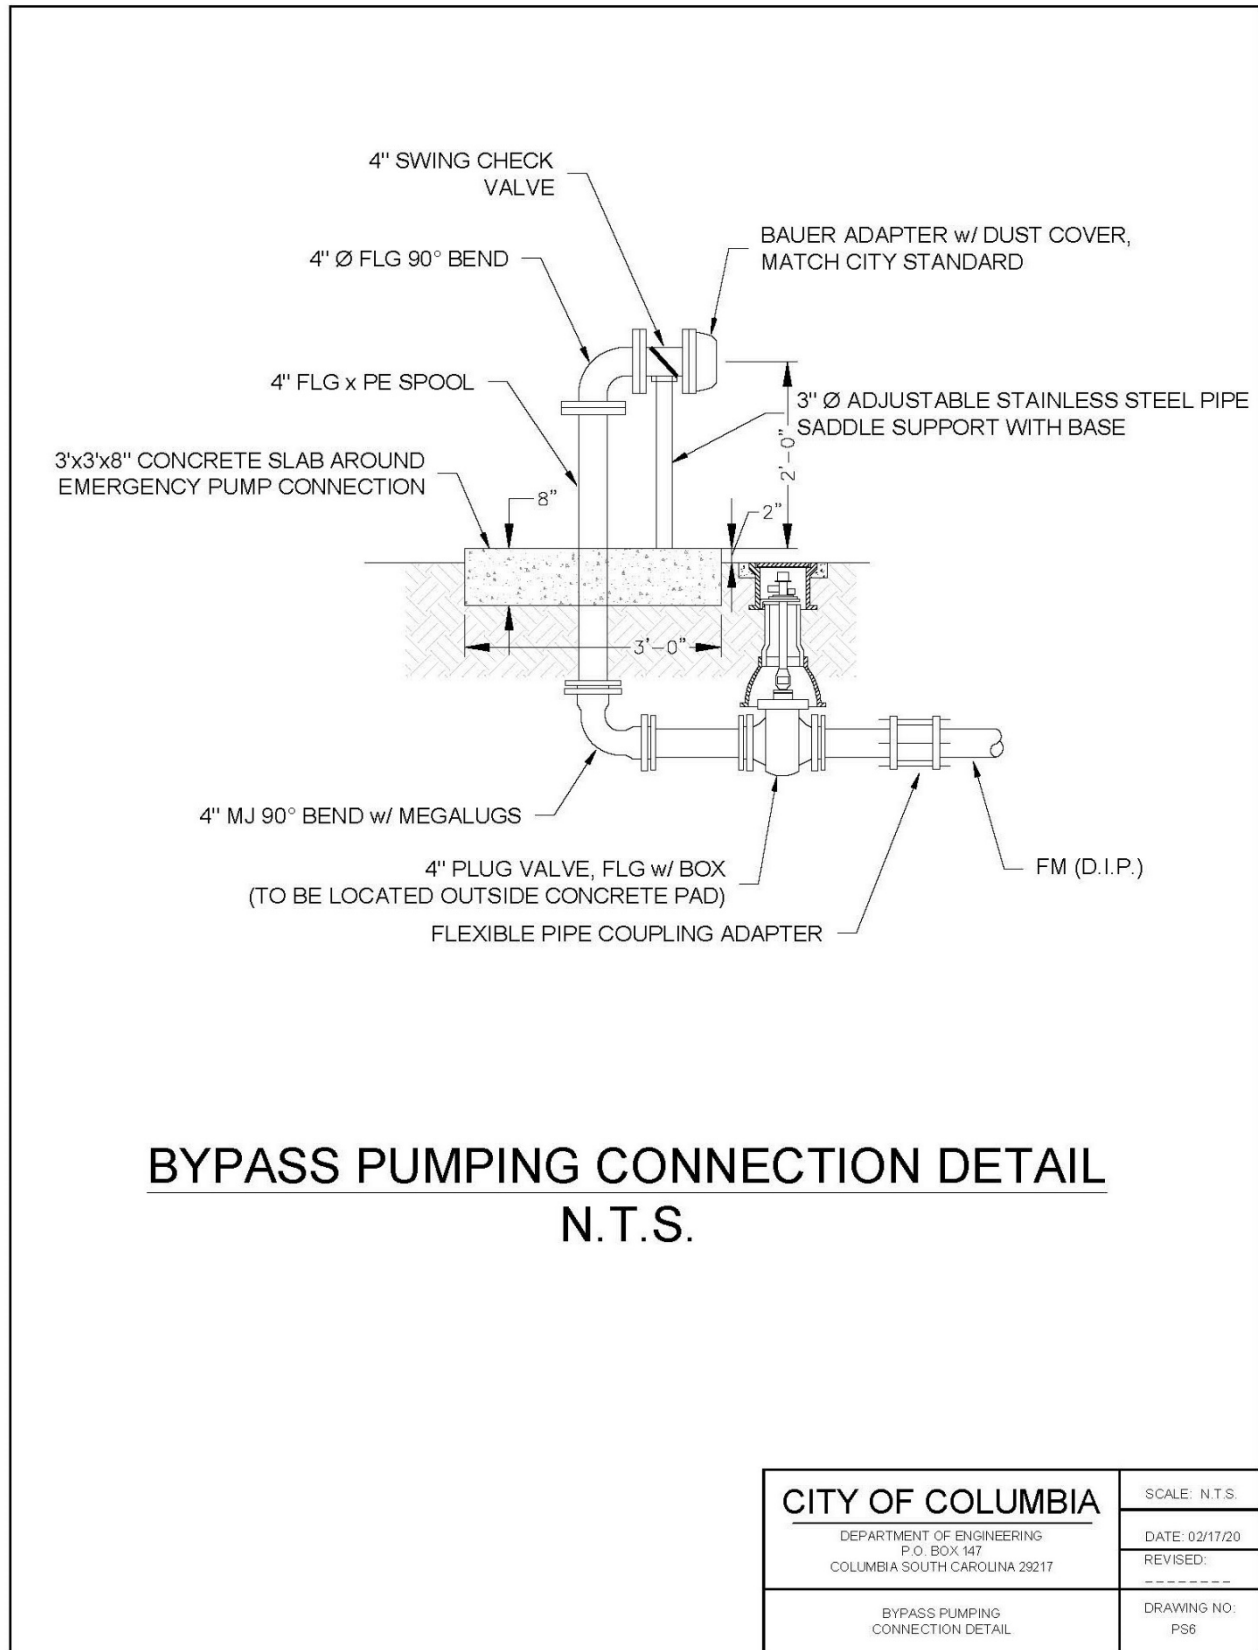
PS6 - Bypass Pumping Connection Detail
